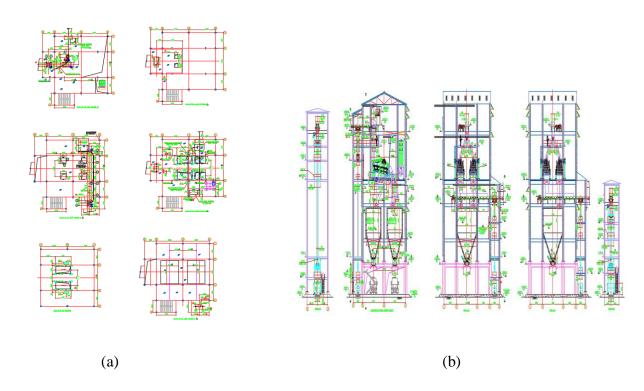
(a) Plan Details (b) Elevation Details of a crusher house
